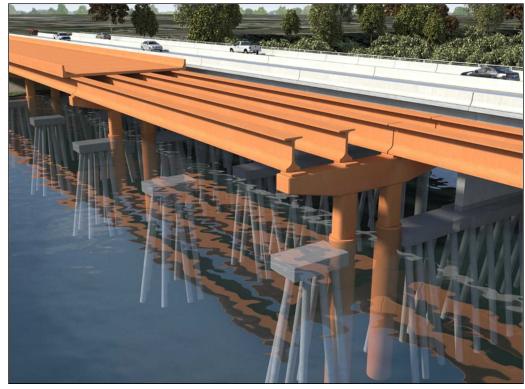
, Illustration of New Piers within Existing Piers of Bridge No. 6224
